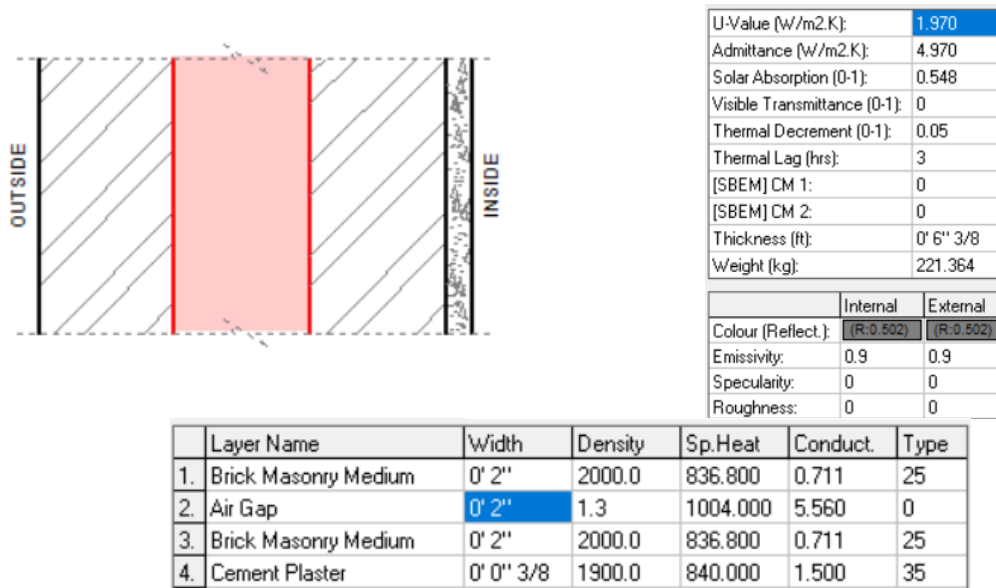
wall section, property of material and the layers of wall material for case scenario 7
